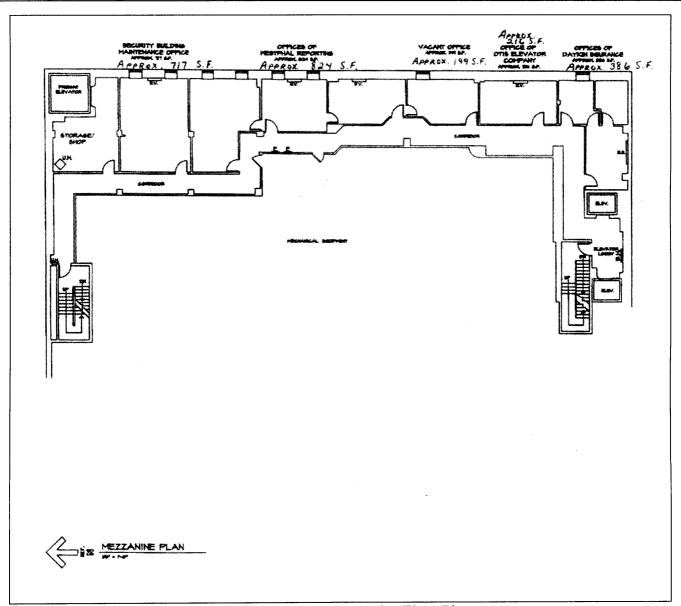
Current Mezzanine Floor Plan (Cottingham & Butler, 2006)
